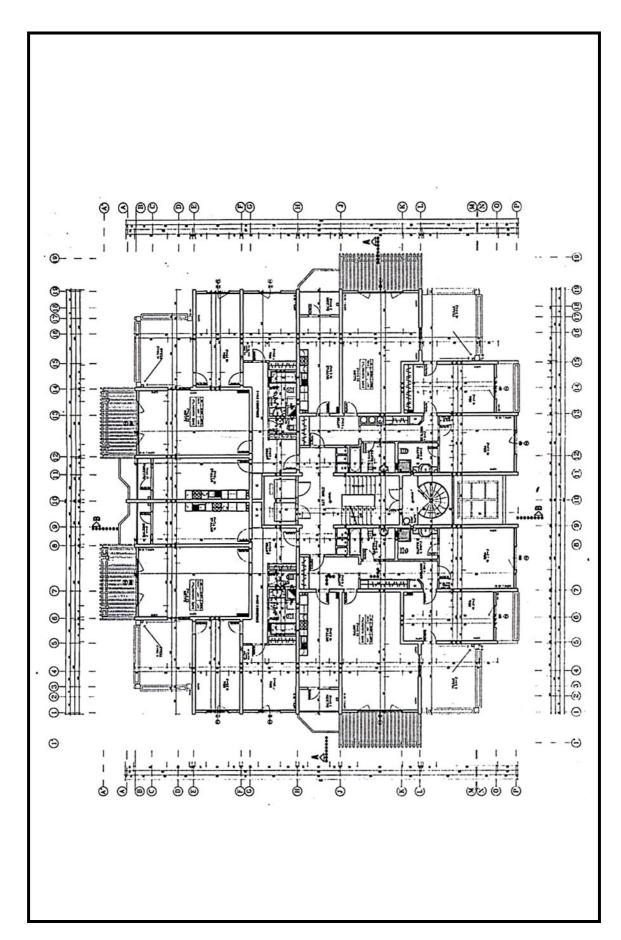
Mavişehir II; Flamingo 15th-Floor Plan
